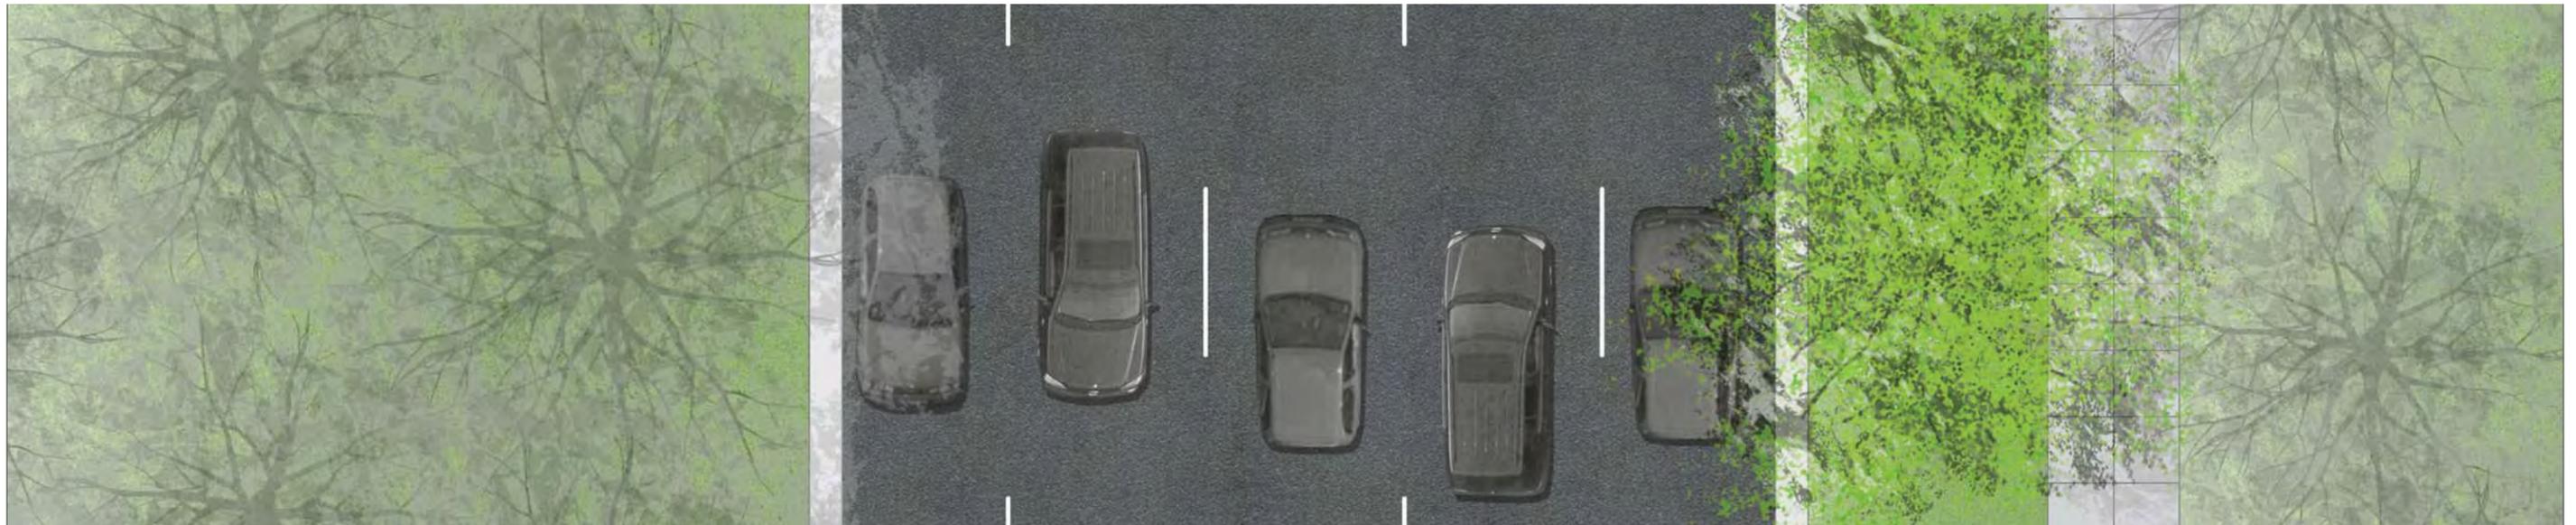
E. Old Shakopee Road Plan and Cross Section
